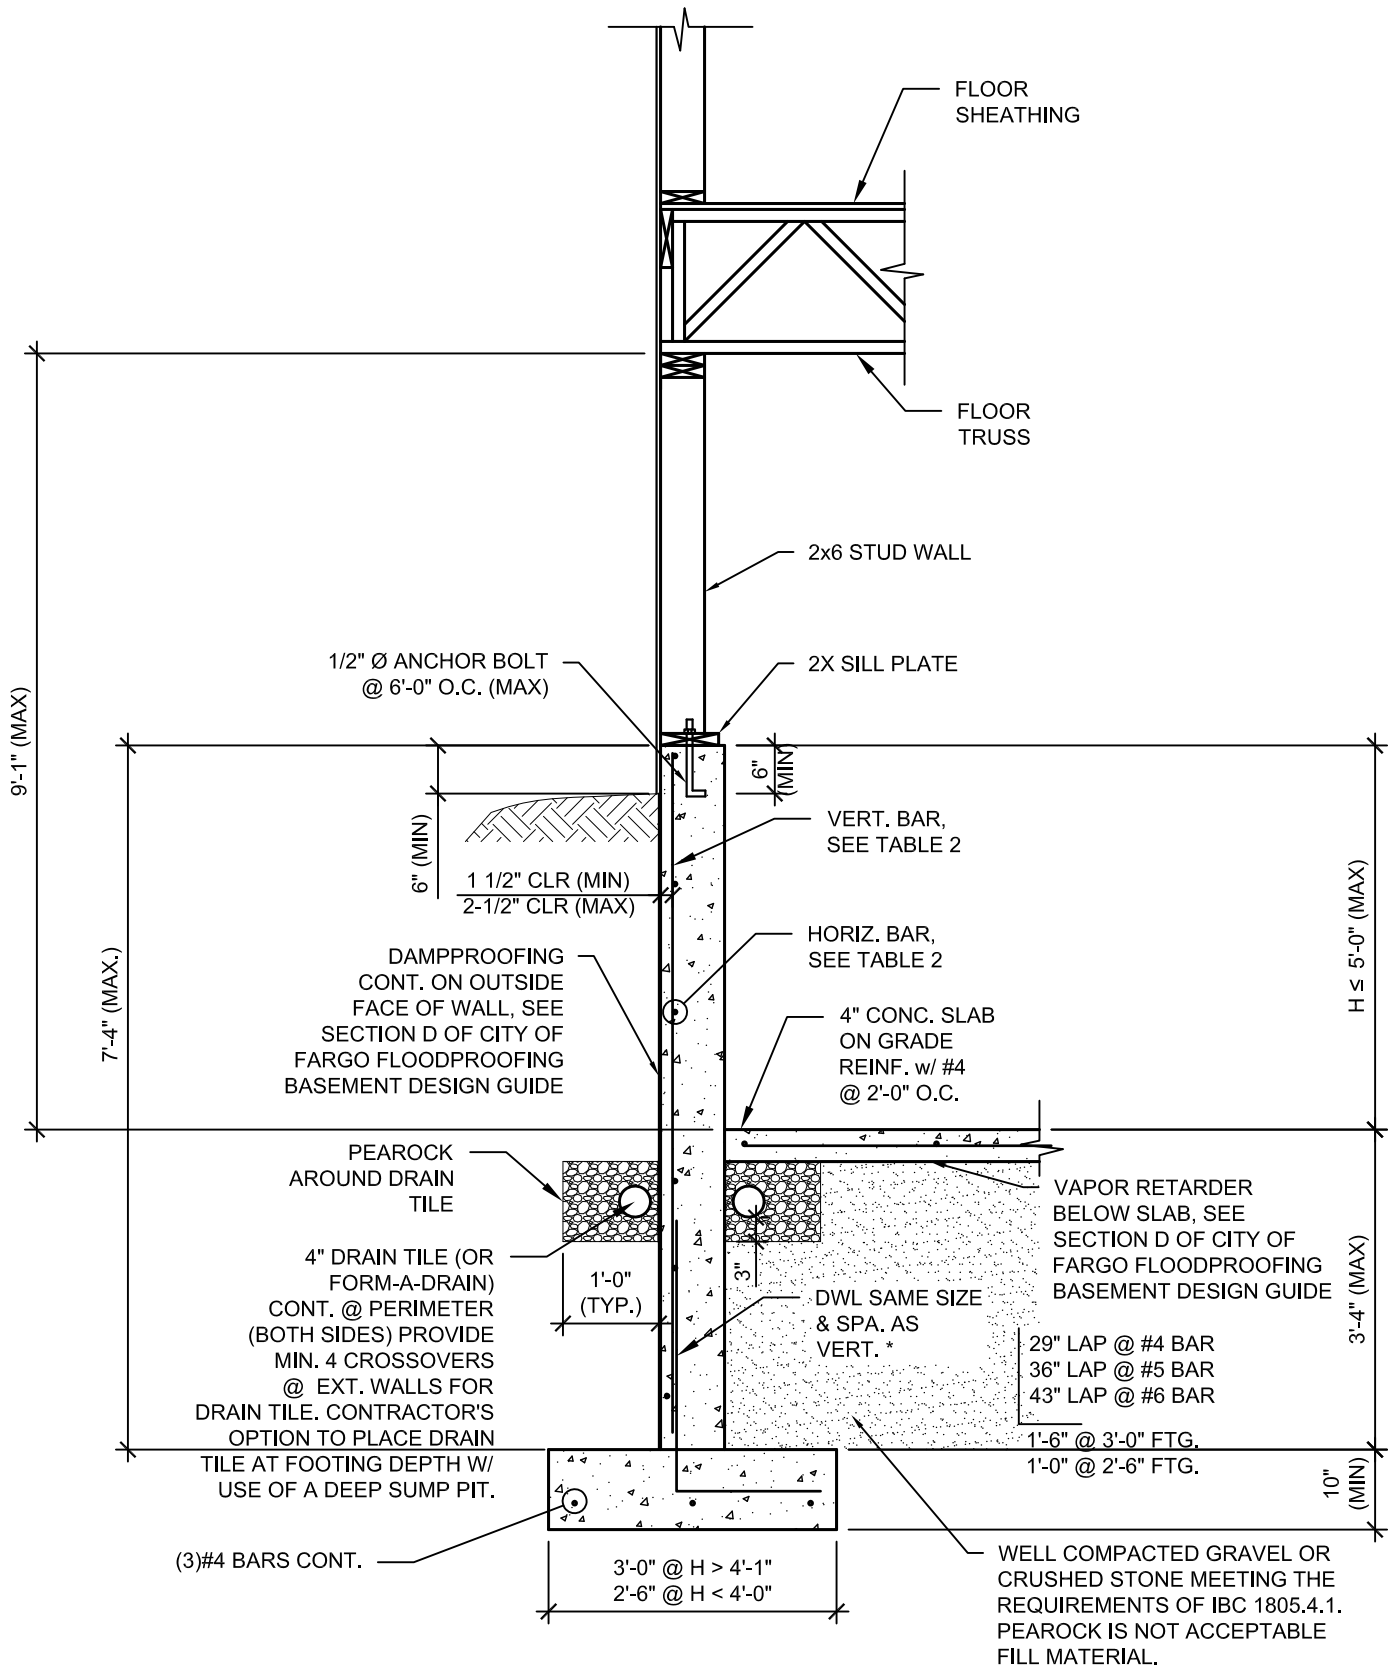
BI-LEVEL BASEMENT WALL SECTION
